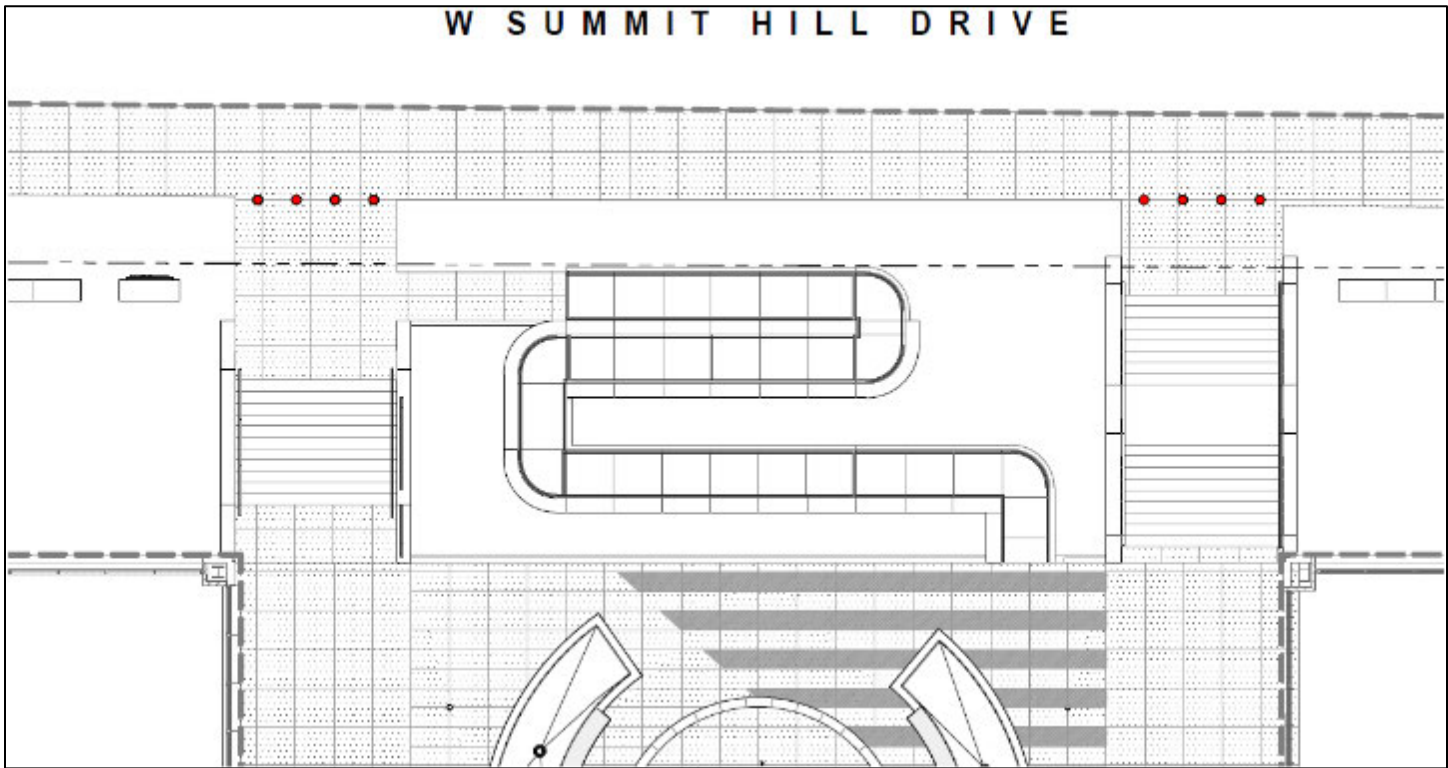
Plan view of proposed bollards at the entrance of the KOC Plaza from West Summit Hill Drive.
